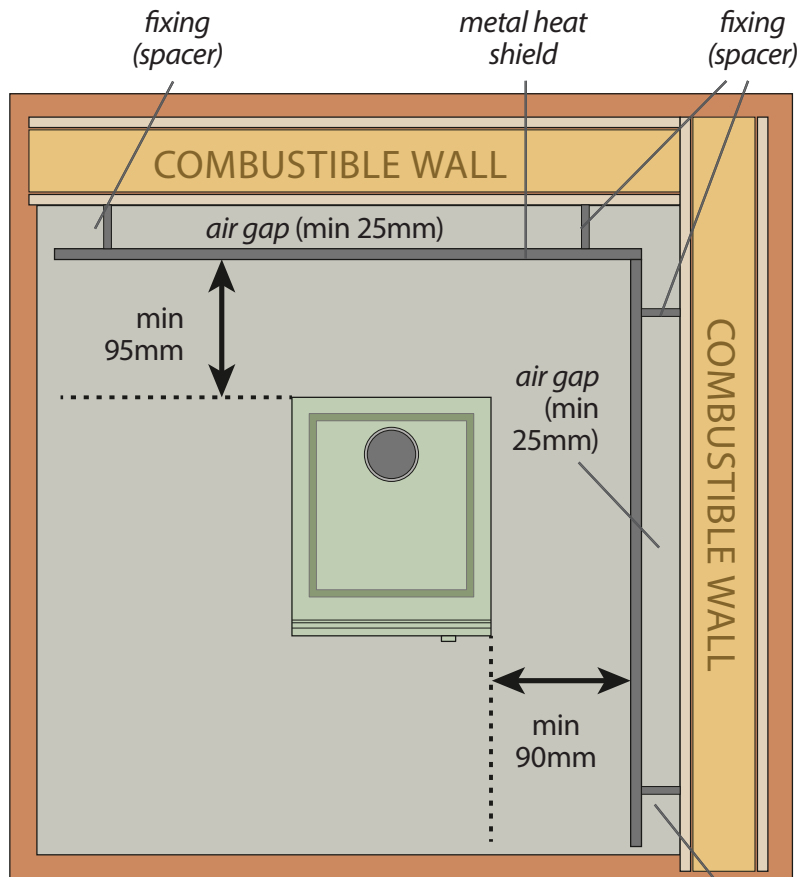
Minimum Shielding Distances using Metal Heat Shield
